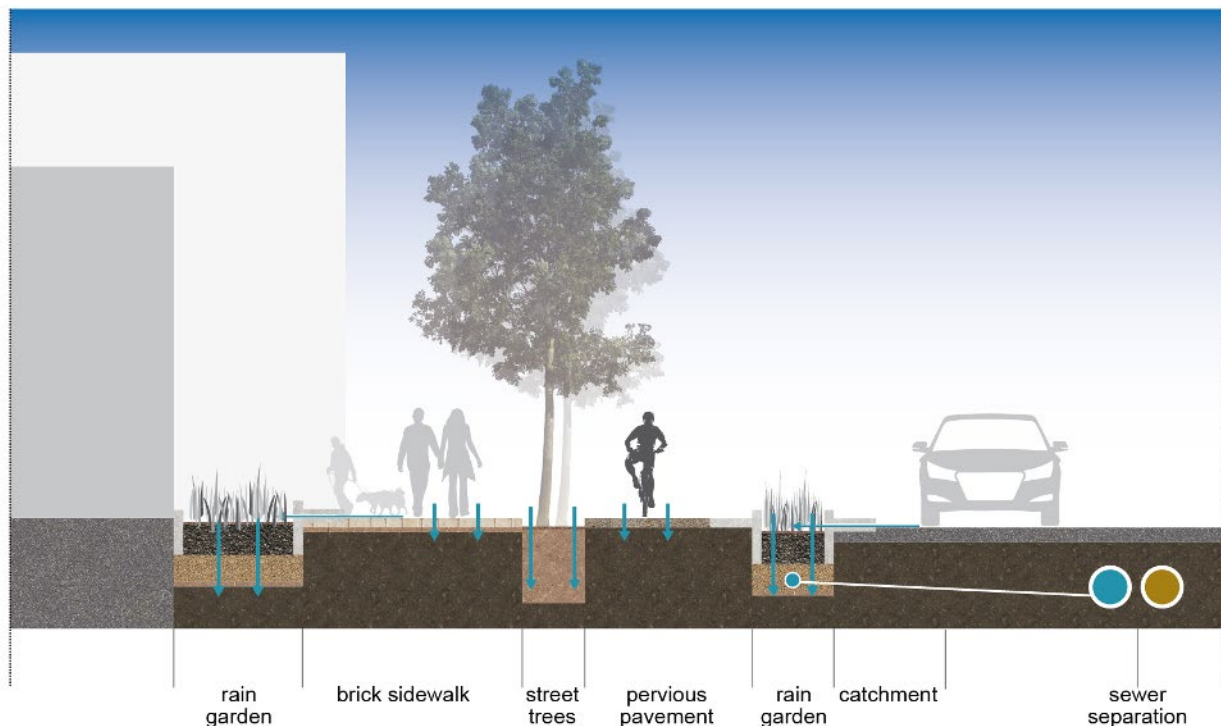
Greater Boston (Cambridge), section of Western Avenue. Source: original drawing by arch. M. Padrone.
